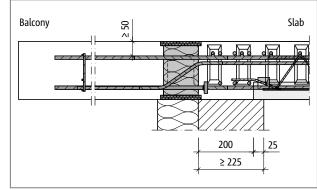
Schöck Isokorb® XT type C: Prefabricated slab without edge support with TICS (section XT type C-R-CV50, view XT type C-L-CV35)
